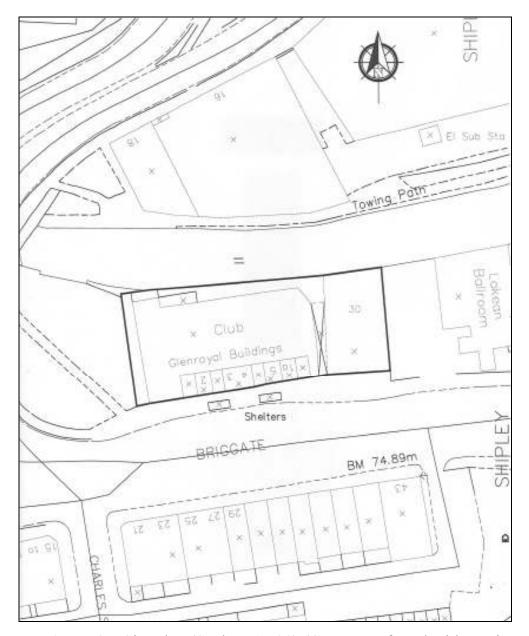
Site plan (Scale = 1:500) (Courtesy of Beckwith Design Associates Ltd)
